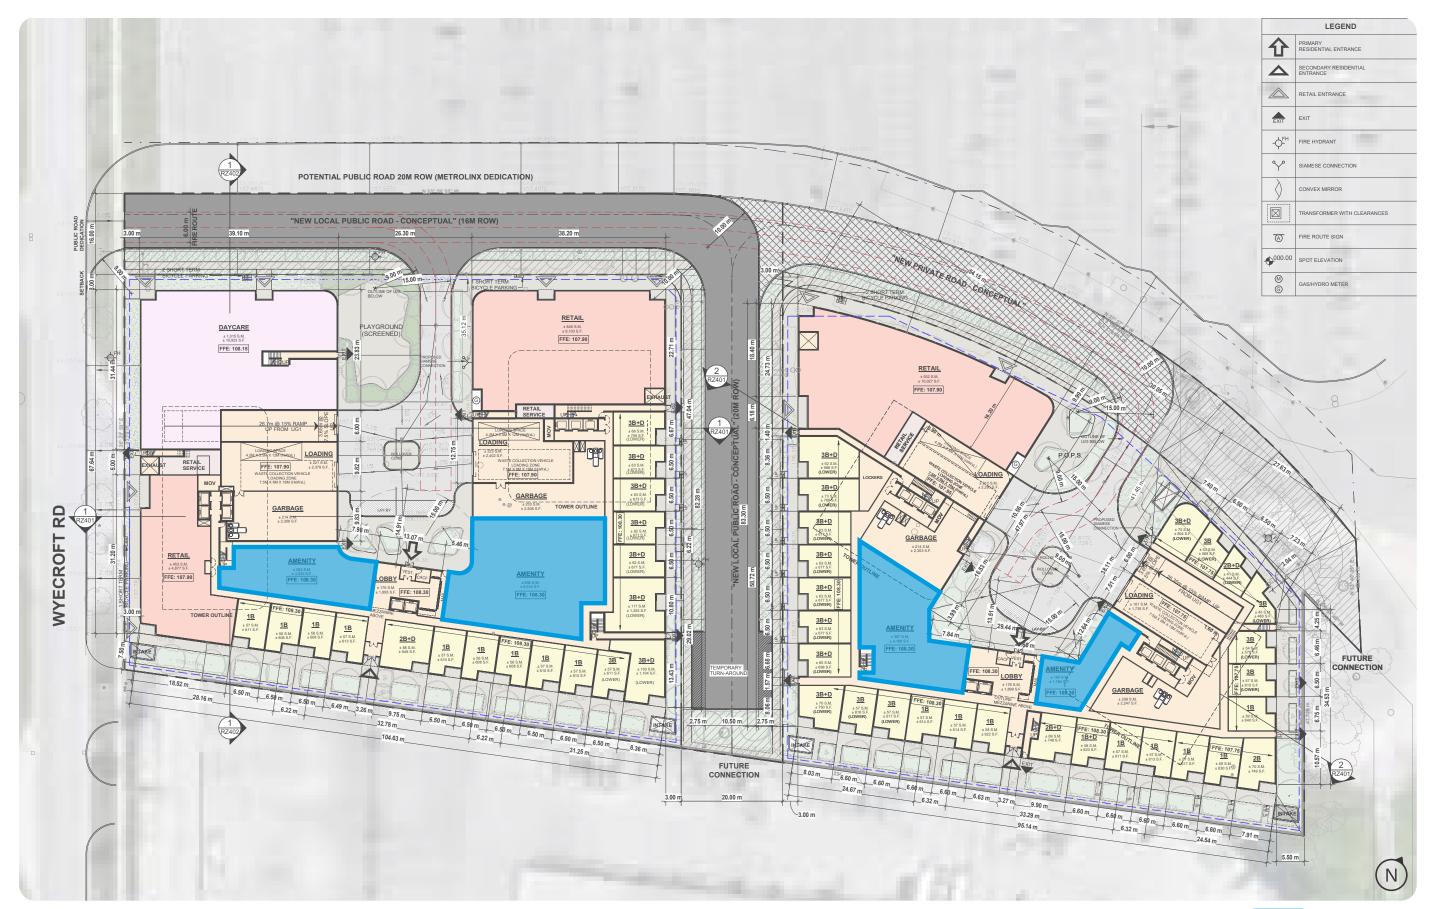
Amenity Plan - 1st Floor (Prepared by Turner Fleisher, July 2025)
